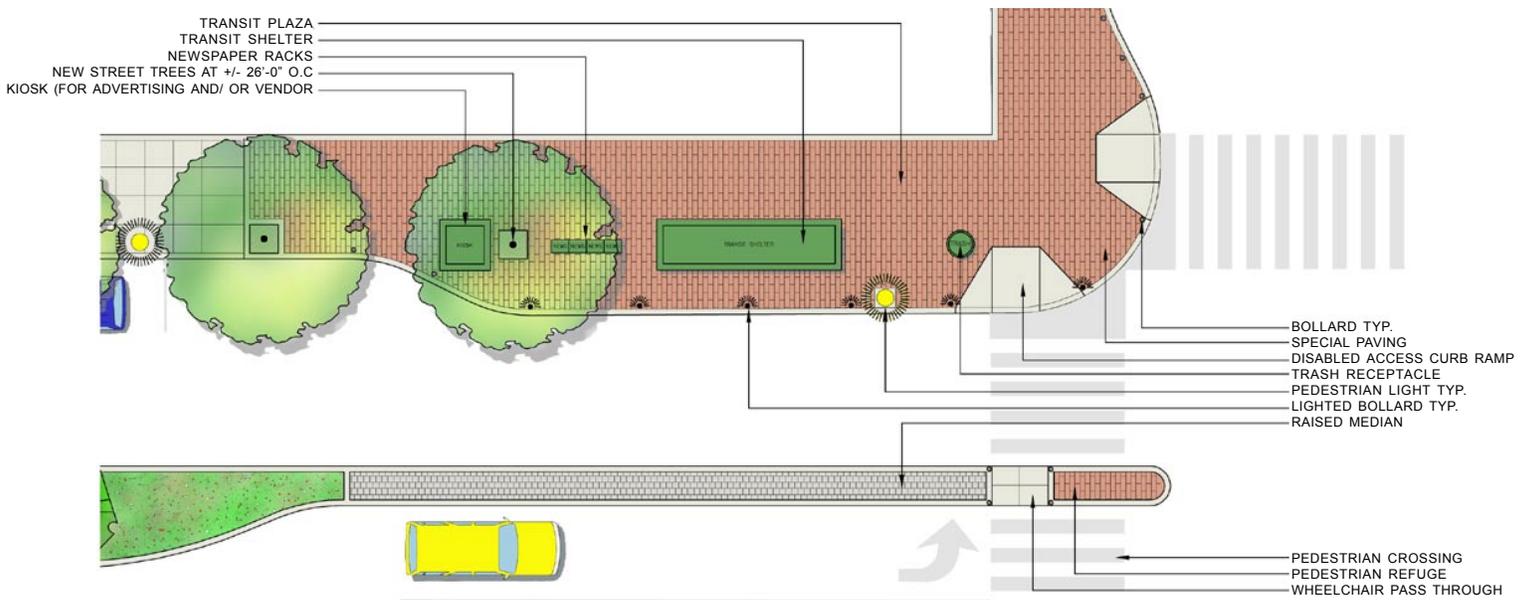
13th Street Prototypical Large Corner Sidewalk Extension with Optional Median
